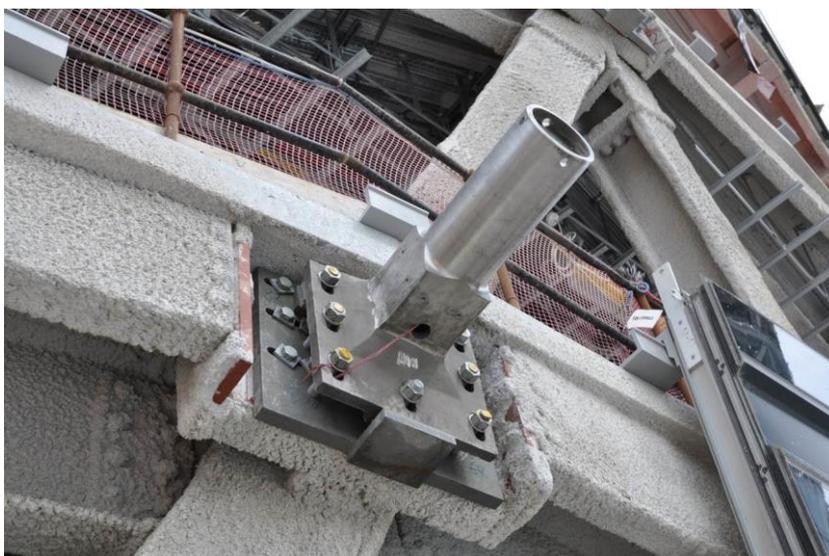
Stub connection for Mashrabiya, bolted to ends of radial beams to house cantilever bracket (Arup)
